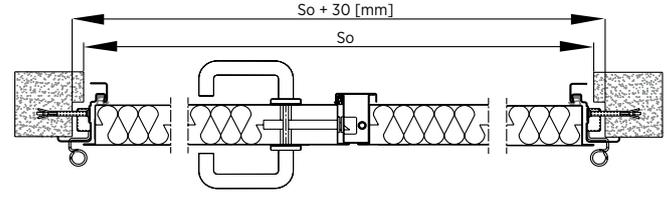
Installation of the double-leaf door with the corner frame in a masonry wall, horizontal cross-section
